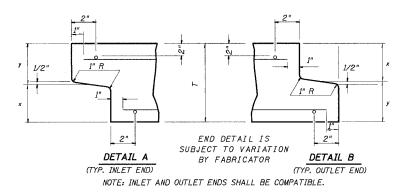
## DETAIL OF PRECAST CONCRETE BOX CULVERT M273M
